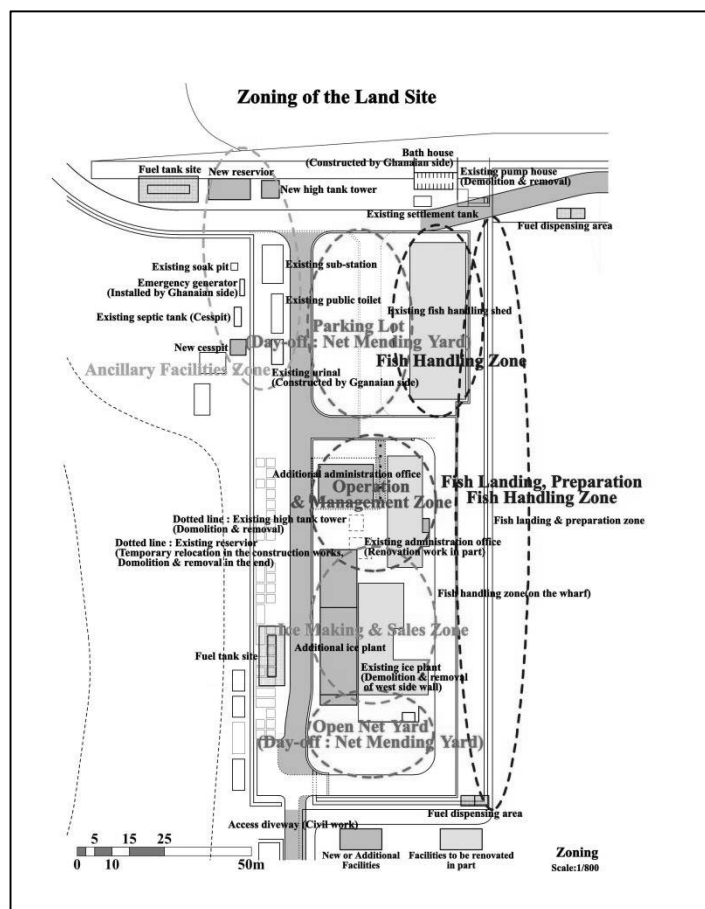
(1) Zoning of Land Facilities and Equipment
